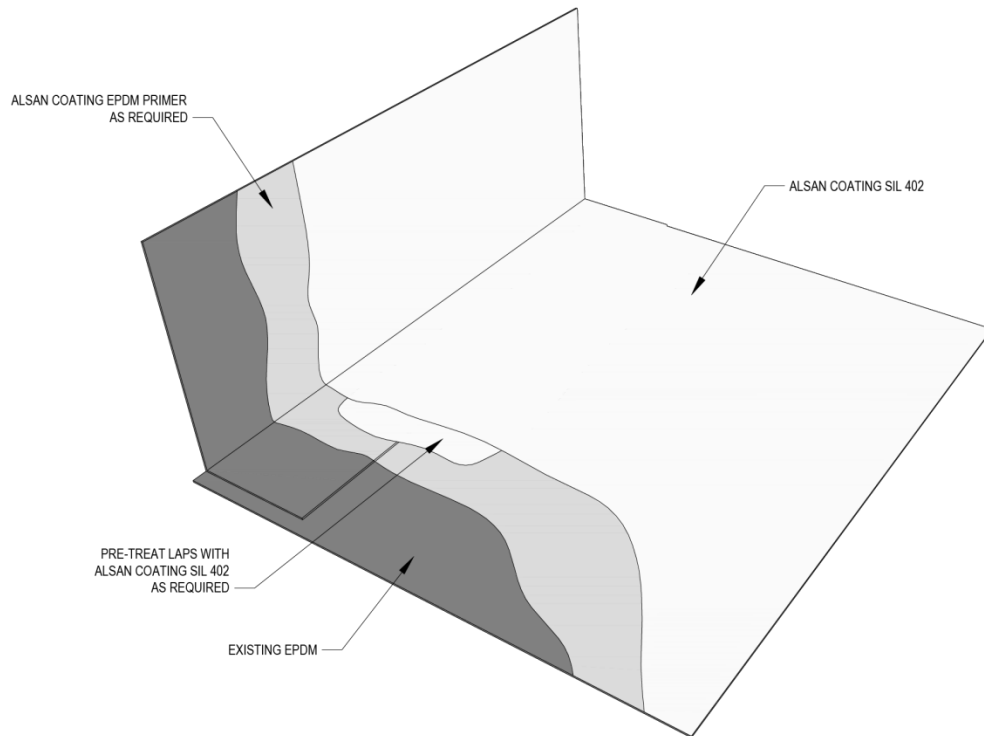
Silicone Roof Coating Over EPDM, Wall/Curb
